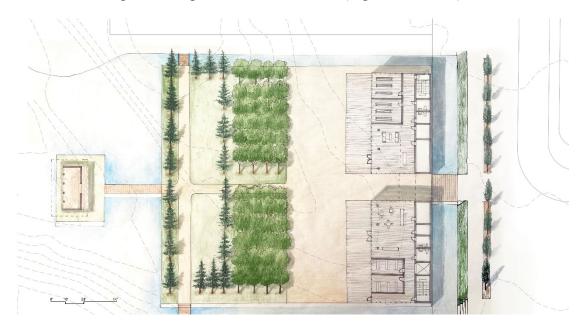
Recreation Center Floor Plan 1 (Source: Author)
